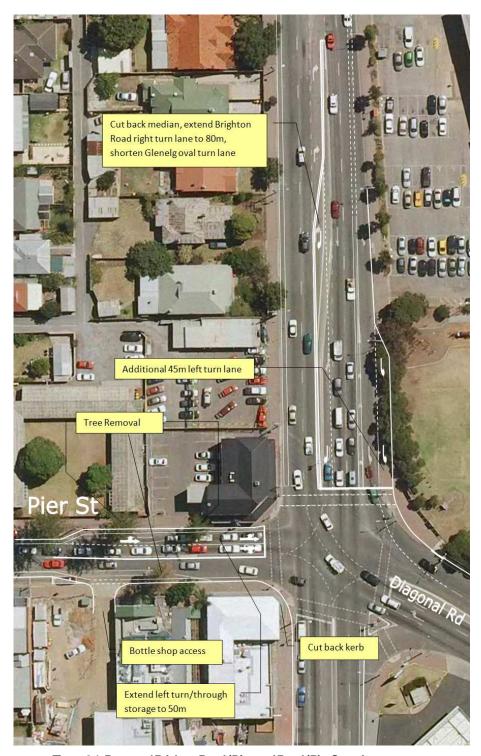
Proposed Brighton Road / Diagonal Road / Pier Street Improvements
